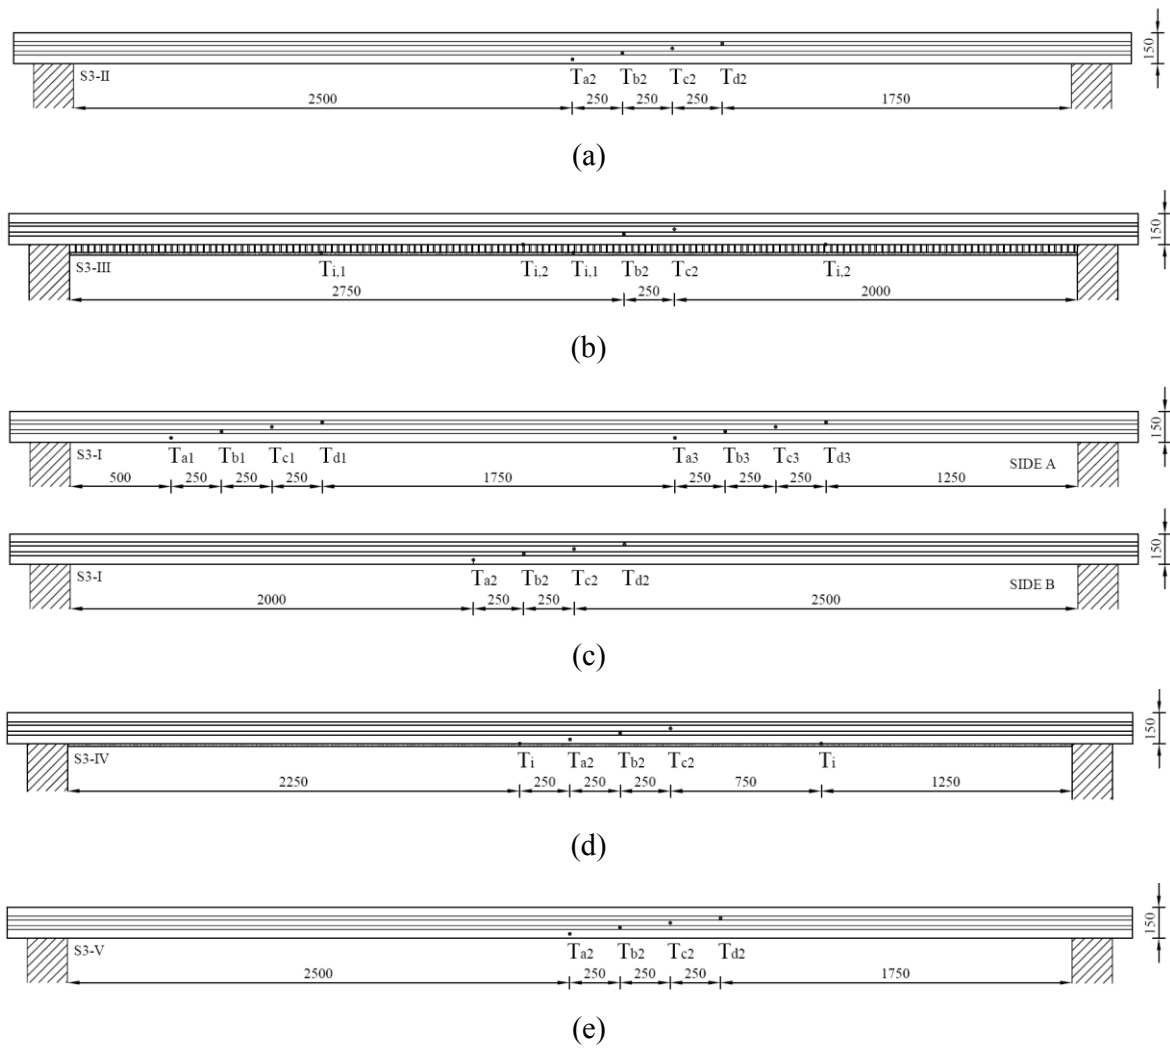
Longitudinal cross-sections with thermocouple layout (dimensions in mm): (a) specimen S3-II; (b) specimen S3-III; (c) specimen S3-I; (d) specimen S3-IV; (e) specimen S3-V.
